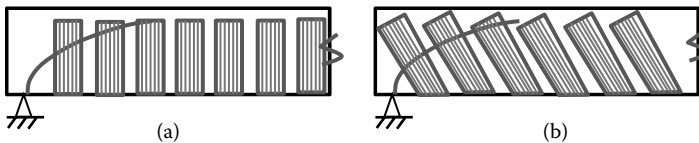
External shear strengthening of concrete beams: (a) 90° U-wrap sheets and (b) 45° side sheets.
